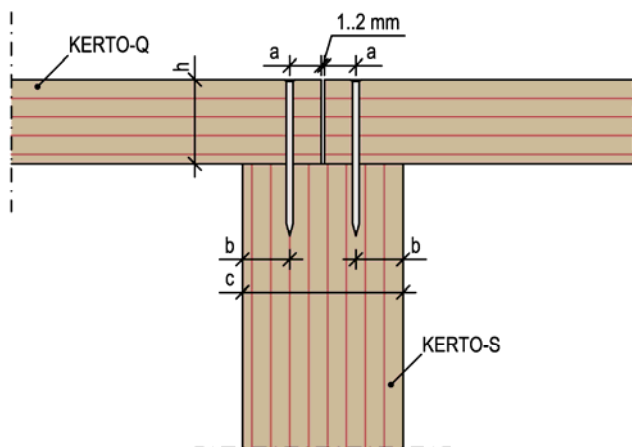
Nailed connection of a Kerto-Q panel and a Kerto-S beam or column.
